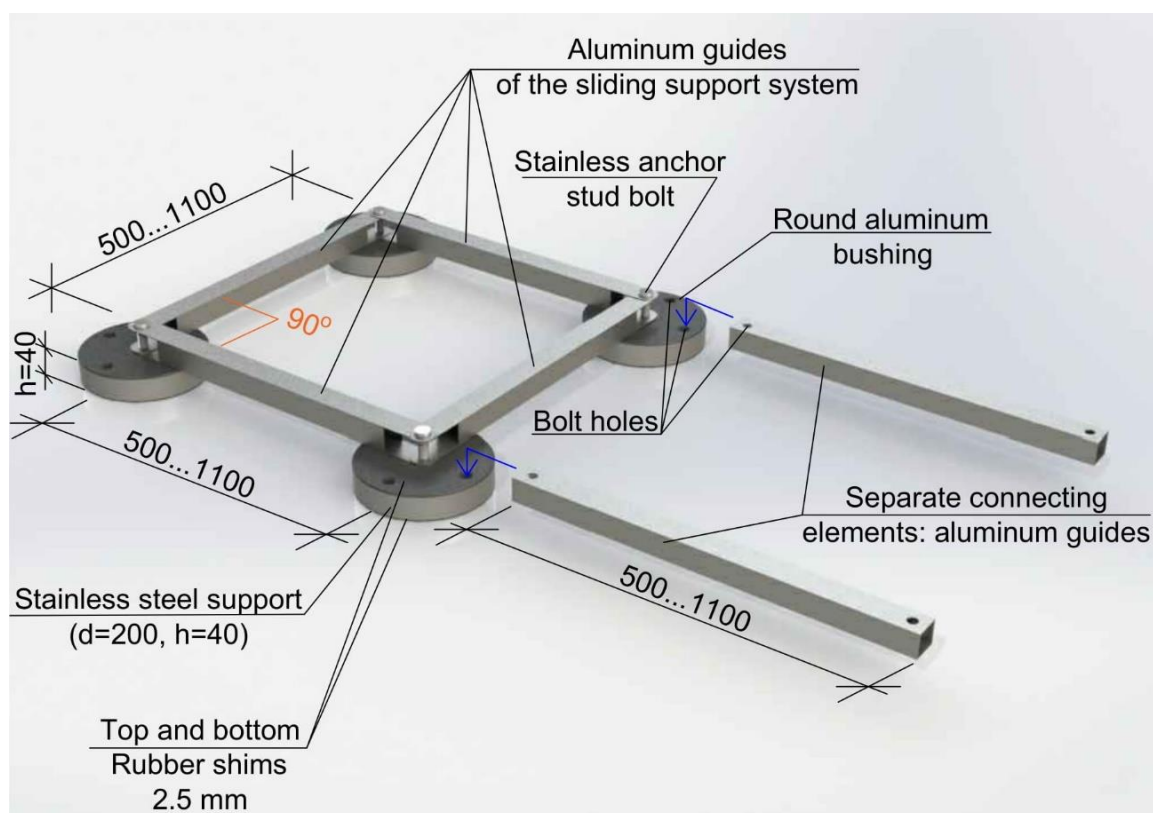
Alternative technical model set of support elements of the roof system: sliding support system and intermediate connecting elements (designed in Autodesk Solidworks 2016)
